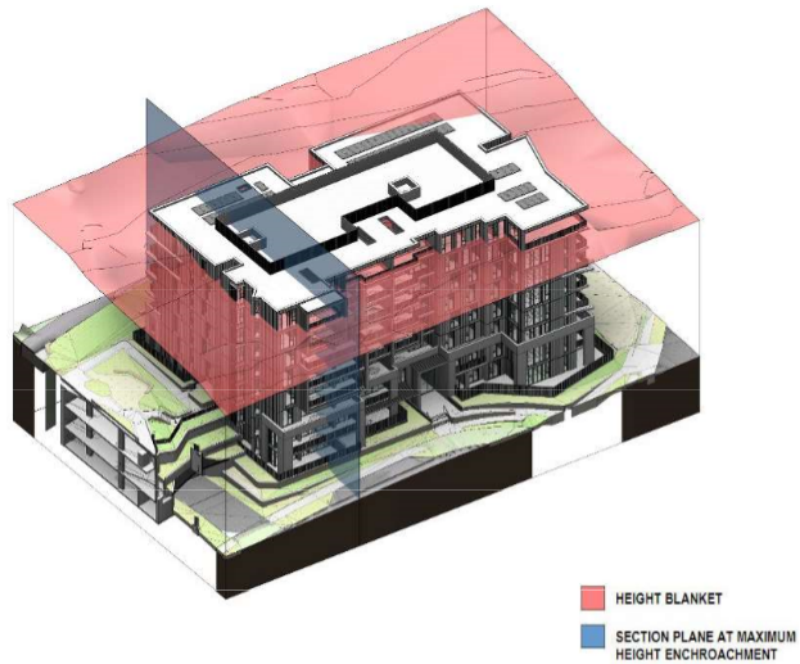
22m Height blanket of Building A (Source: Mirvac Design)
